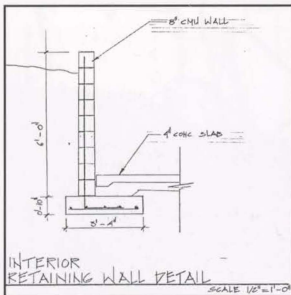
North retaining wall from basement. Image from George Engineering Inc.
